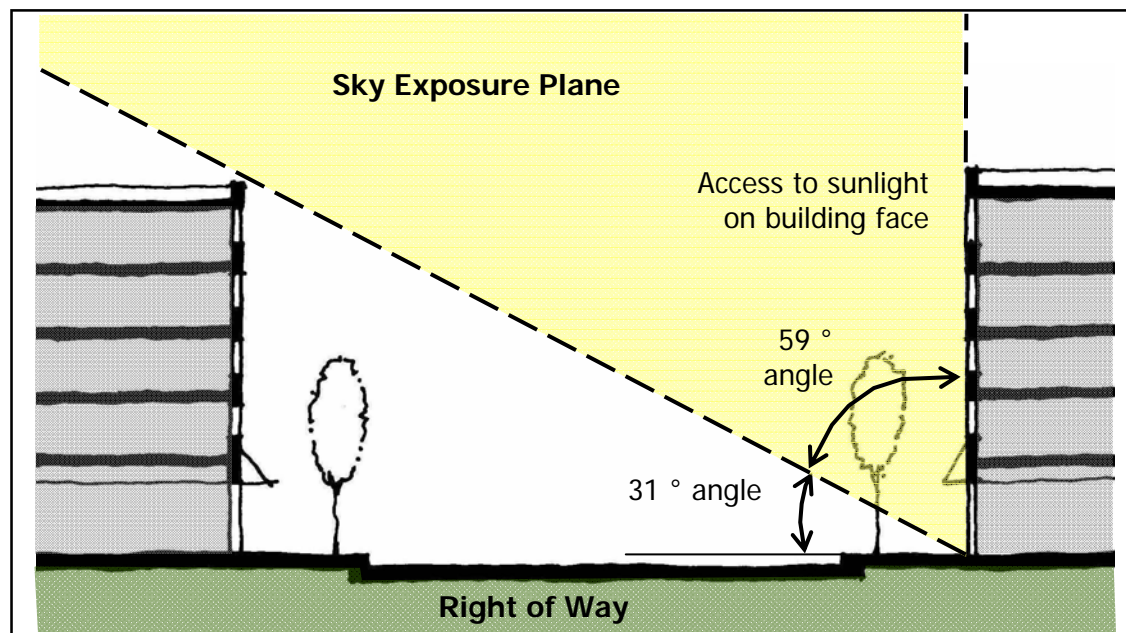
Sky Exposure Plane: Necessity of sunlight to building faces
